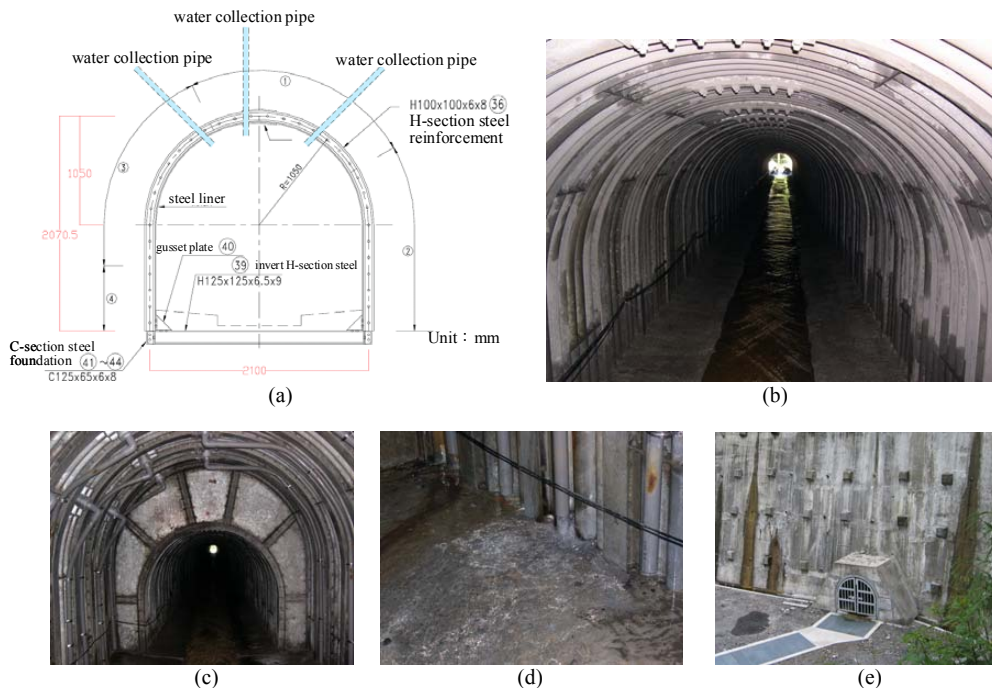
(a) (b) gallery with a smaller cross sectional layout (width×height=2.07 m×2.1 m) for drainage (c) water-collection chamber with enlarged cross section (width×height=3 m×3 m) and sub-vertical drainage boreholes (water collection pipes) (d) groundwater collected in chamber (e) outlet of gallery
